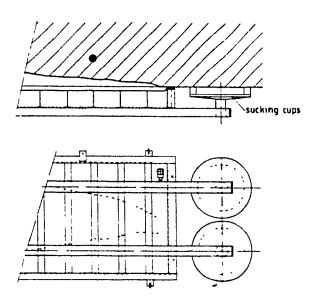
FORMWORK FASTENED BY SUCTION CUPS
